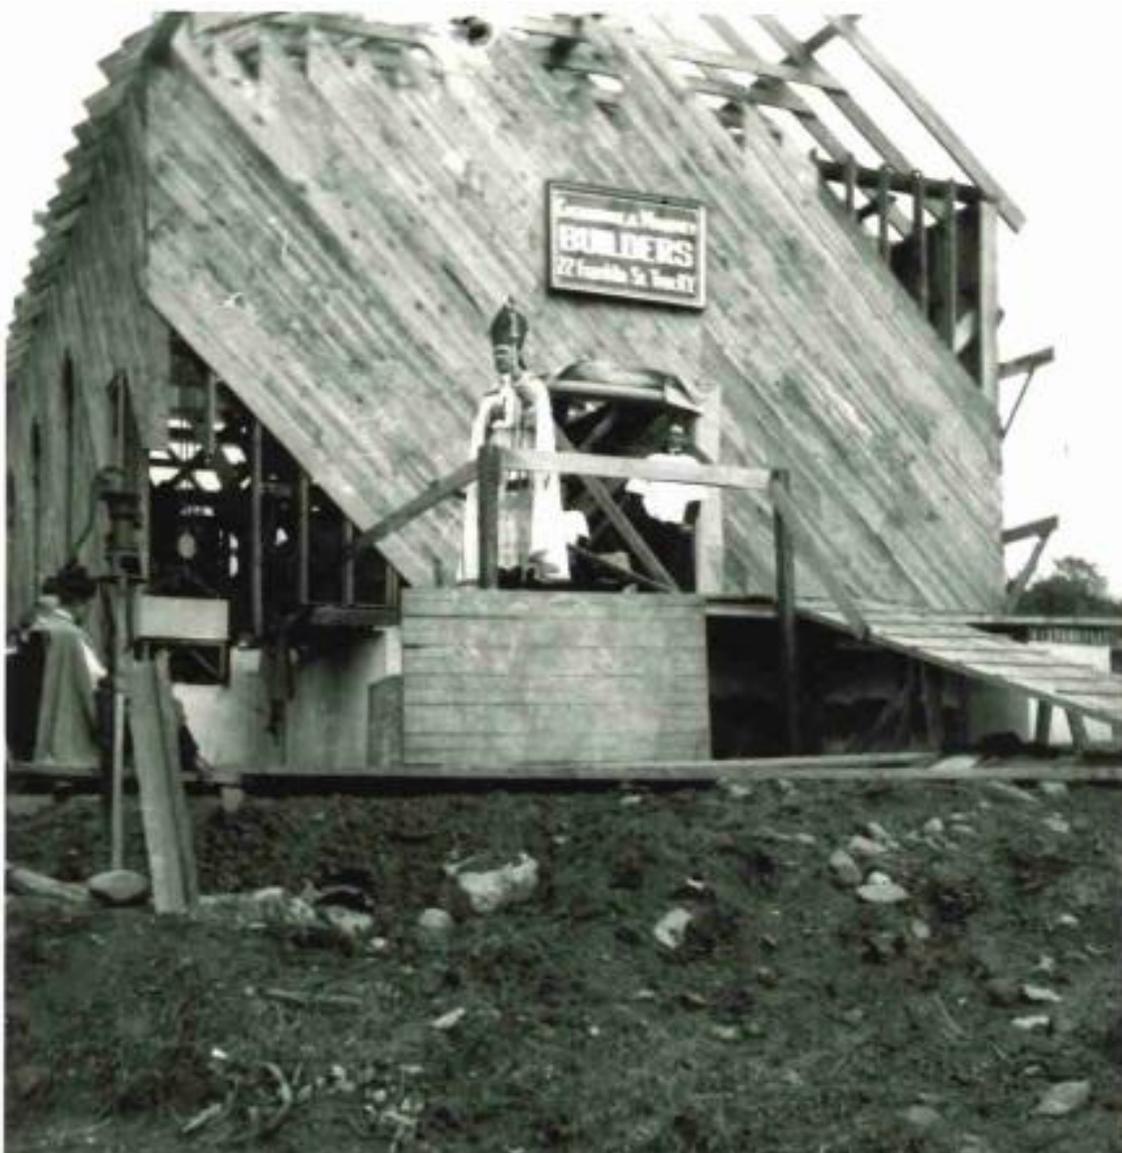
Cornerstone laying ceremony for the Catholic church, showing its wood frame construction, subsequently covered by a brick and stone veneer (Private Collection).
